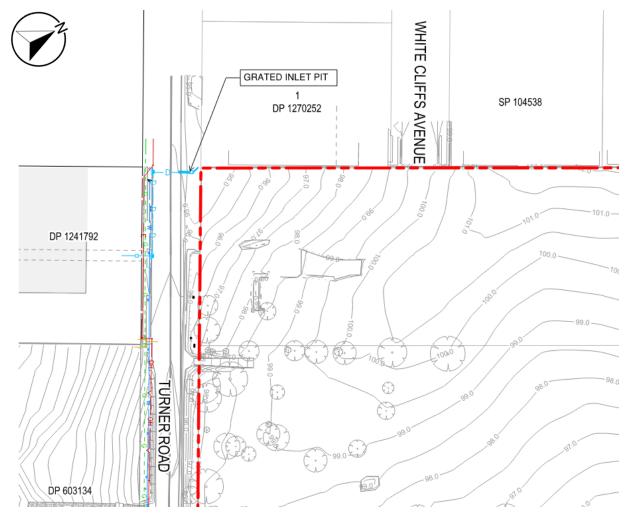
Existing Private Stormwater Assets Near the Subject Site.
